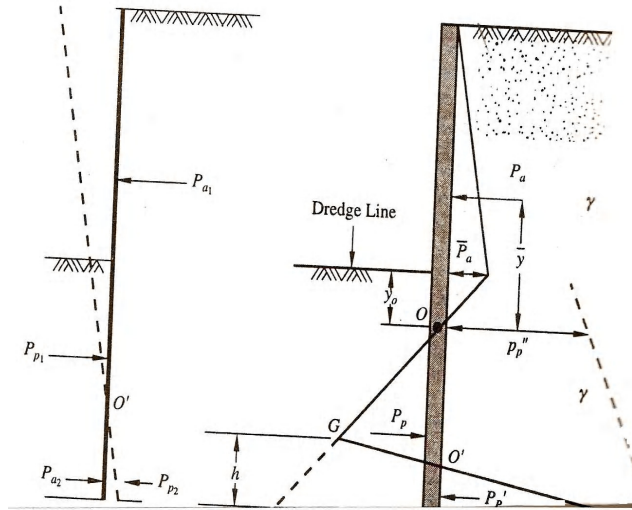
Typical Pressure Diagram on Cantilever Wall
